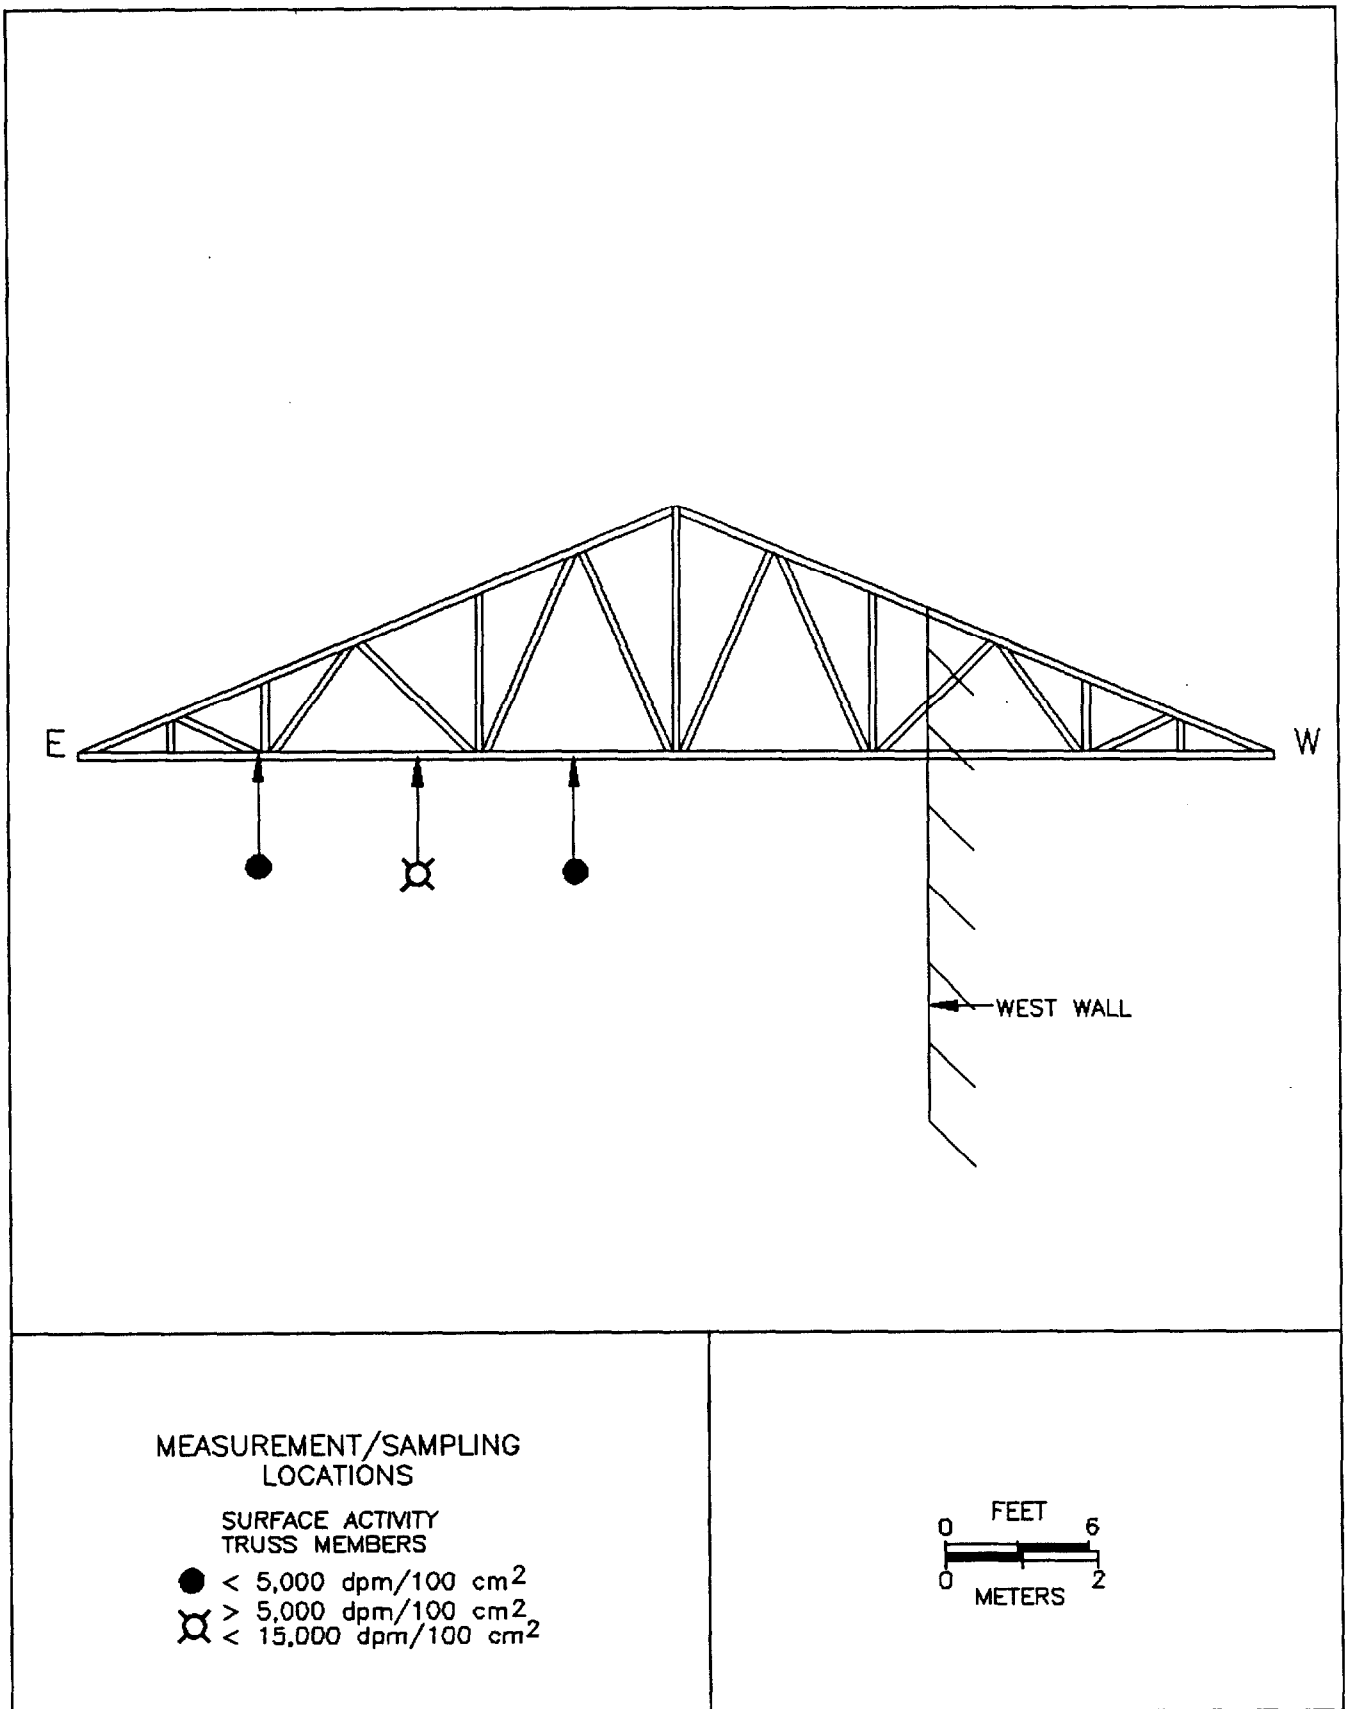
Building 8, Truss 4 - Measurement and Sampling Locations
